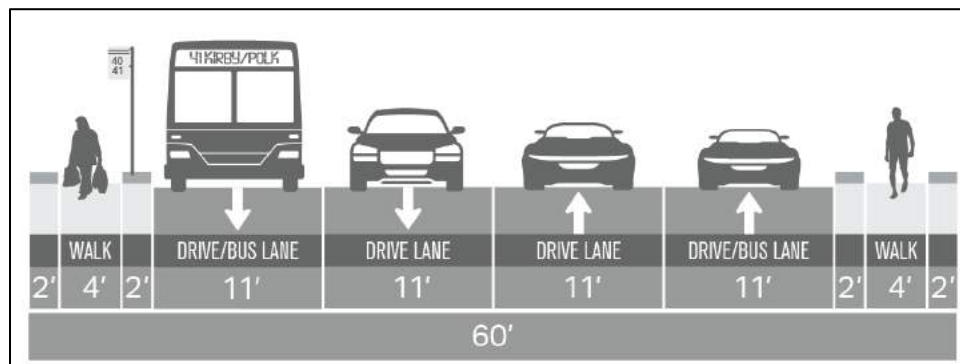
Existing Typical Section of W Dallas Street between Waugh Drive and Montrose Boulevard
